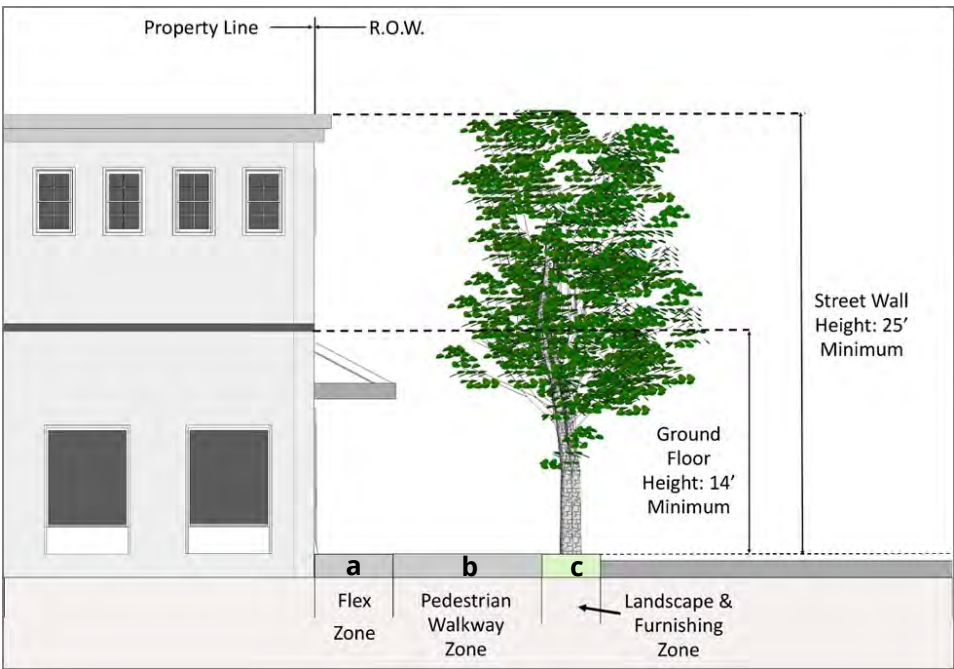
shows the Street Elevation and Sidewalk Zones for a 2-story building. Regardless of the number of stories, the minimum Street Wall height is 25 feet. Figure D-4 shows the effect of the required 3rd and 4th floor step-back from the front building façade, as well as the street elevation minimums.
